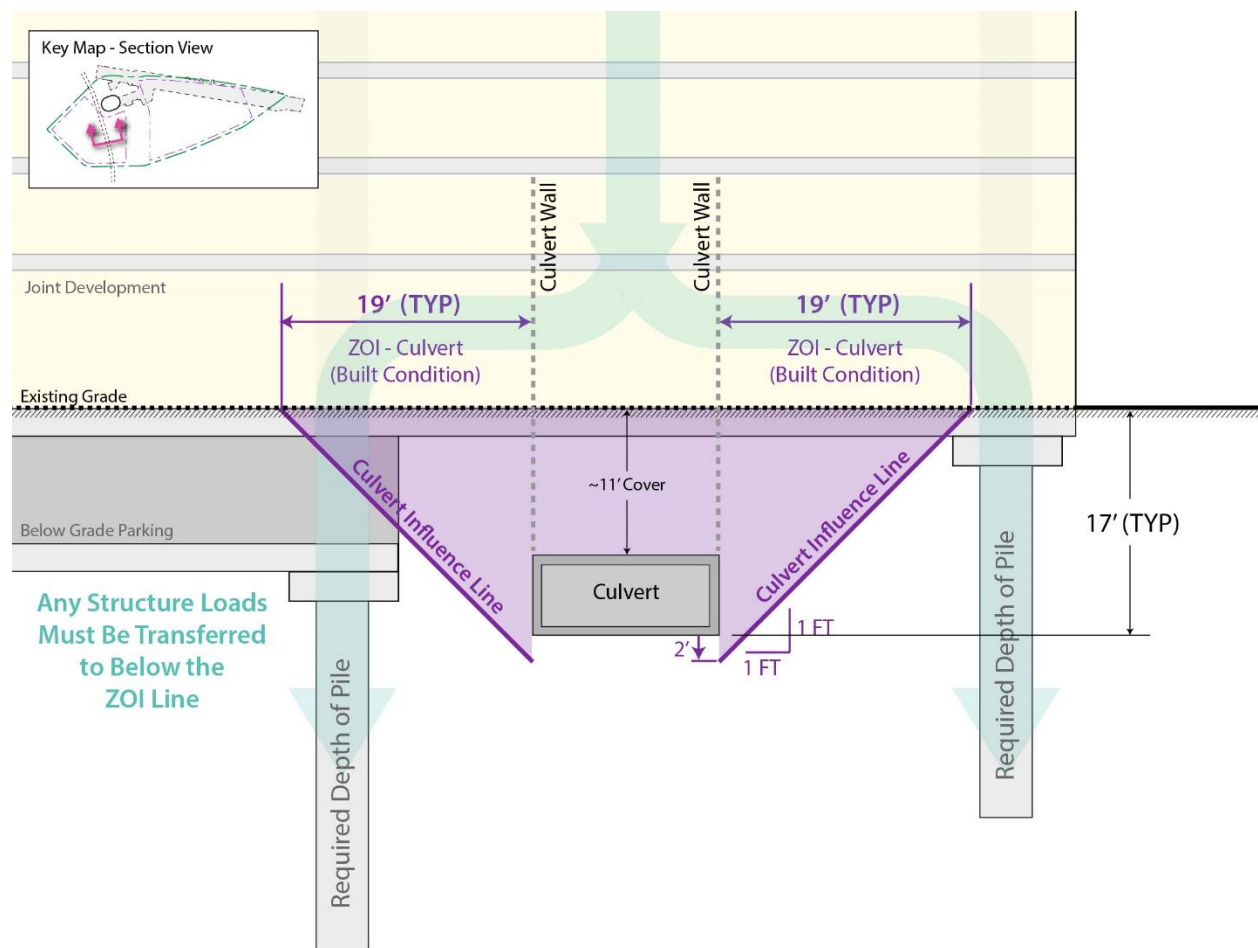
Typical ZOI considerations for the below-grade culvert for the built condition. Actual foundation design, including required depth of pile and any below grade parking, to be determined.
